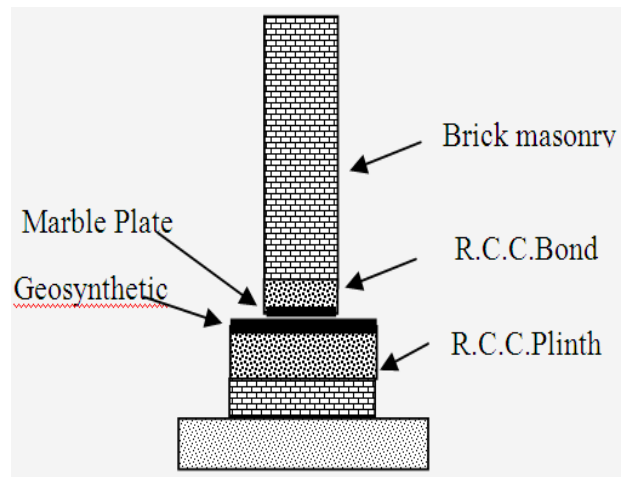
Construction detail for P-F isolation system in brick wall of a brick masonry building
